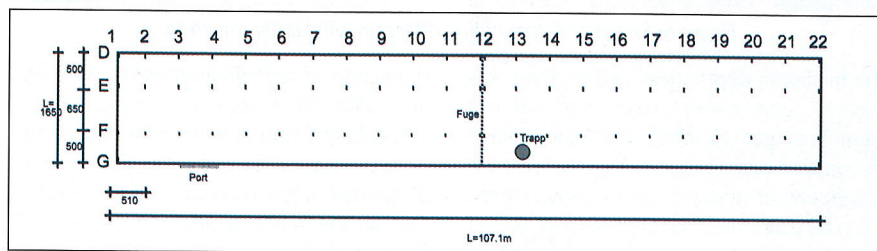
Plan of floors two and three showing the centrally located construction joint and column locations.
